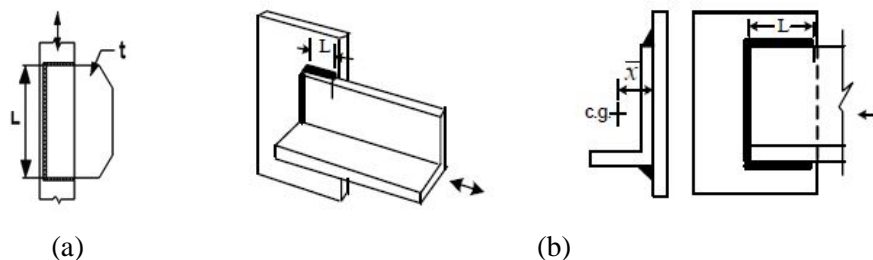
Connection Examples of Detail Category E' for Longitudinally Loaded Welded Attachments (AASHTO, 2014 Table 6.6.1.2.3-1 Description 7.1-7.2)
